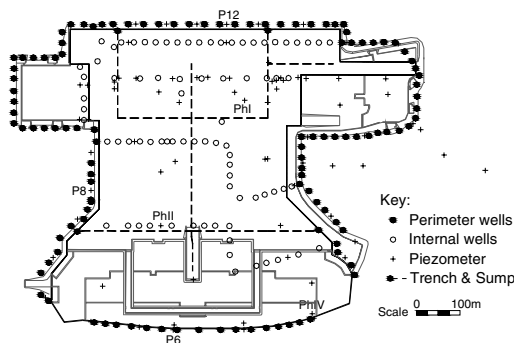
Dewatering well and piezometer 'as built' layout (Roberts et al., 2009)
